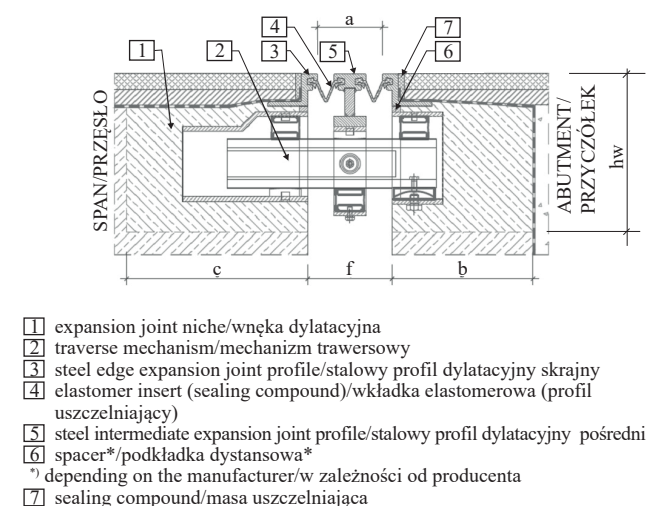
Schematic diagram of a modular expansion joint with a traverse mechanism – cross-section through the carriageway
